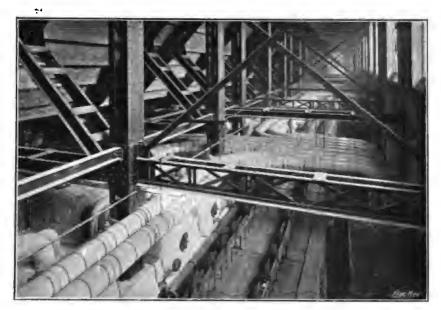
Lots Road, Chelsea: Piping from Eight Boilers to One Header. (Photo by Elec. Review.)
